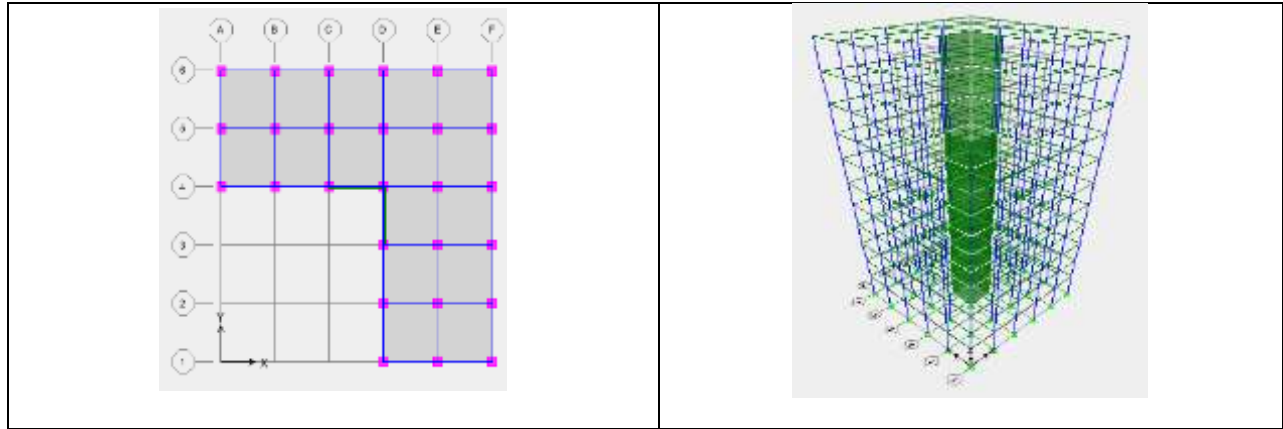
Plan Layout and 3D view of Asymmetric building Model-4
